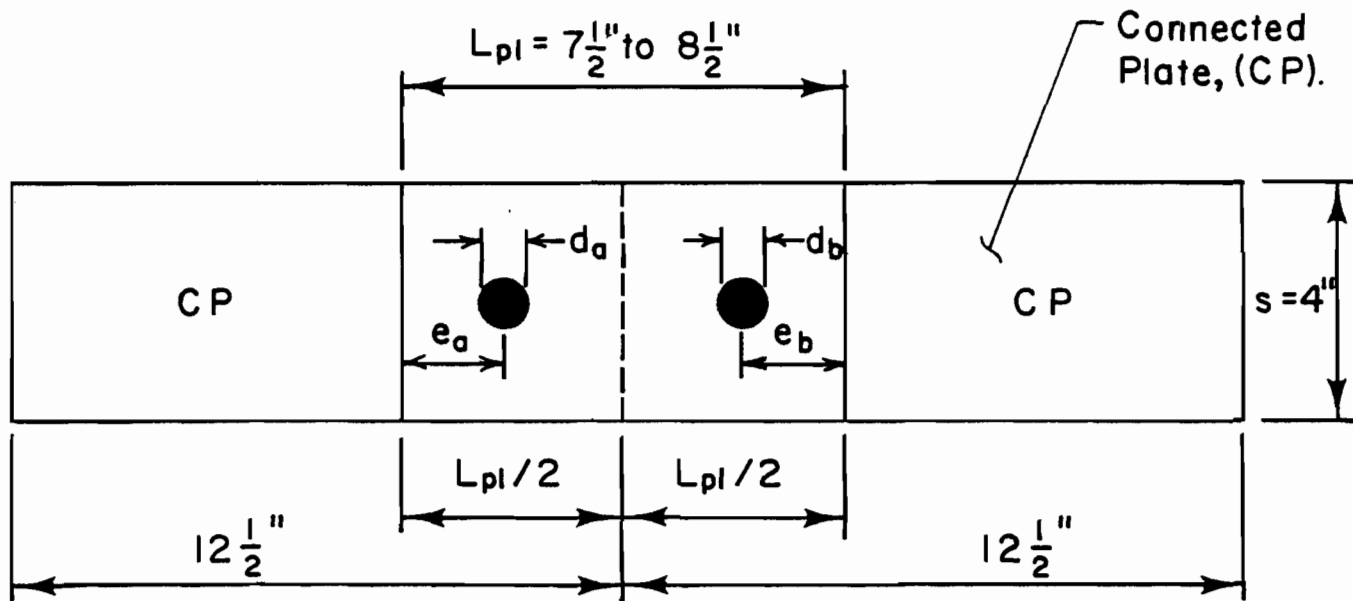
Double-Sheet Puddle Weld Connection
